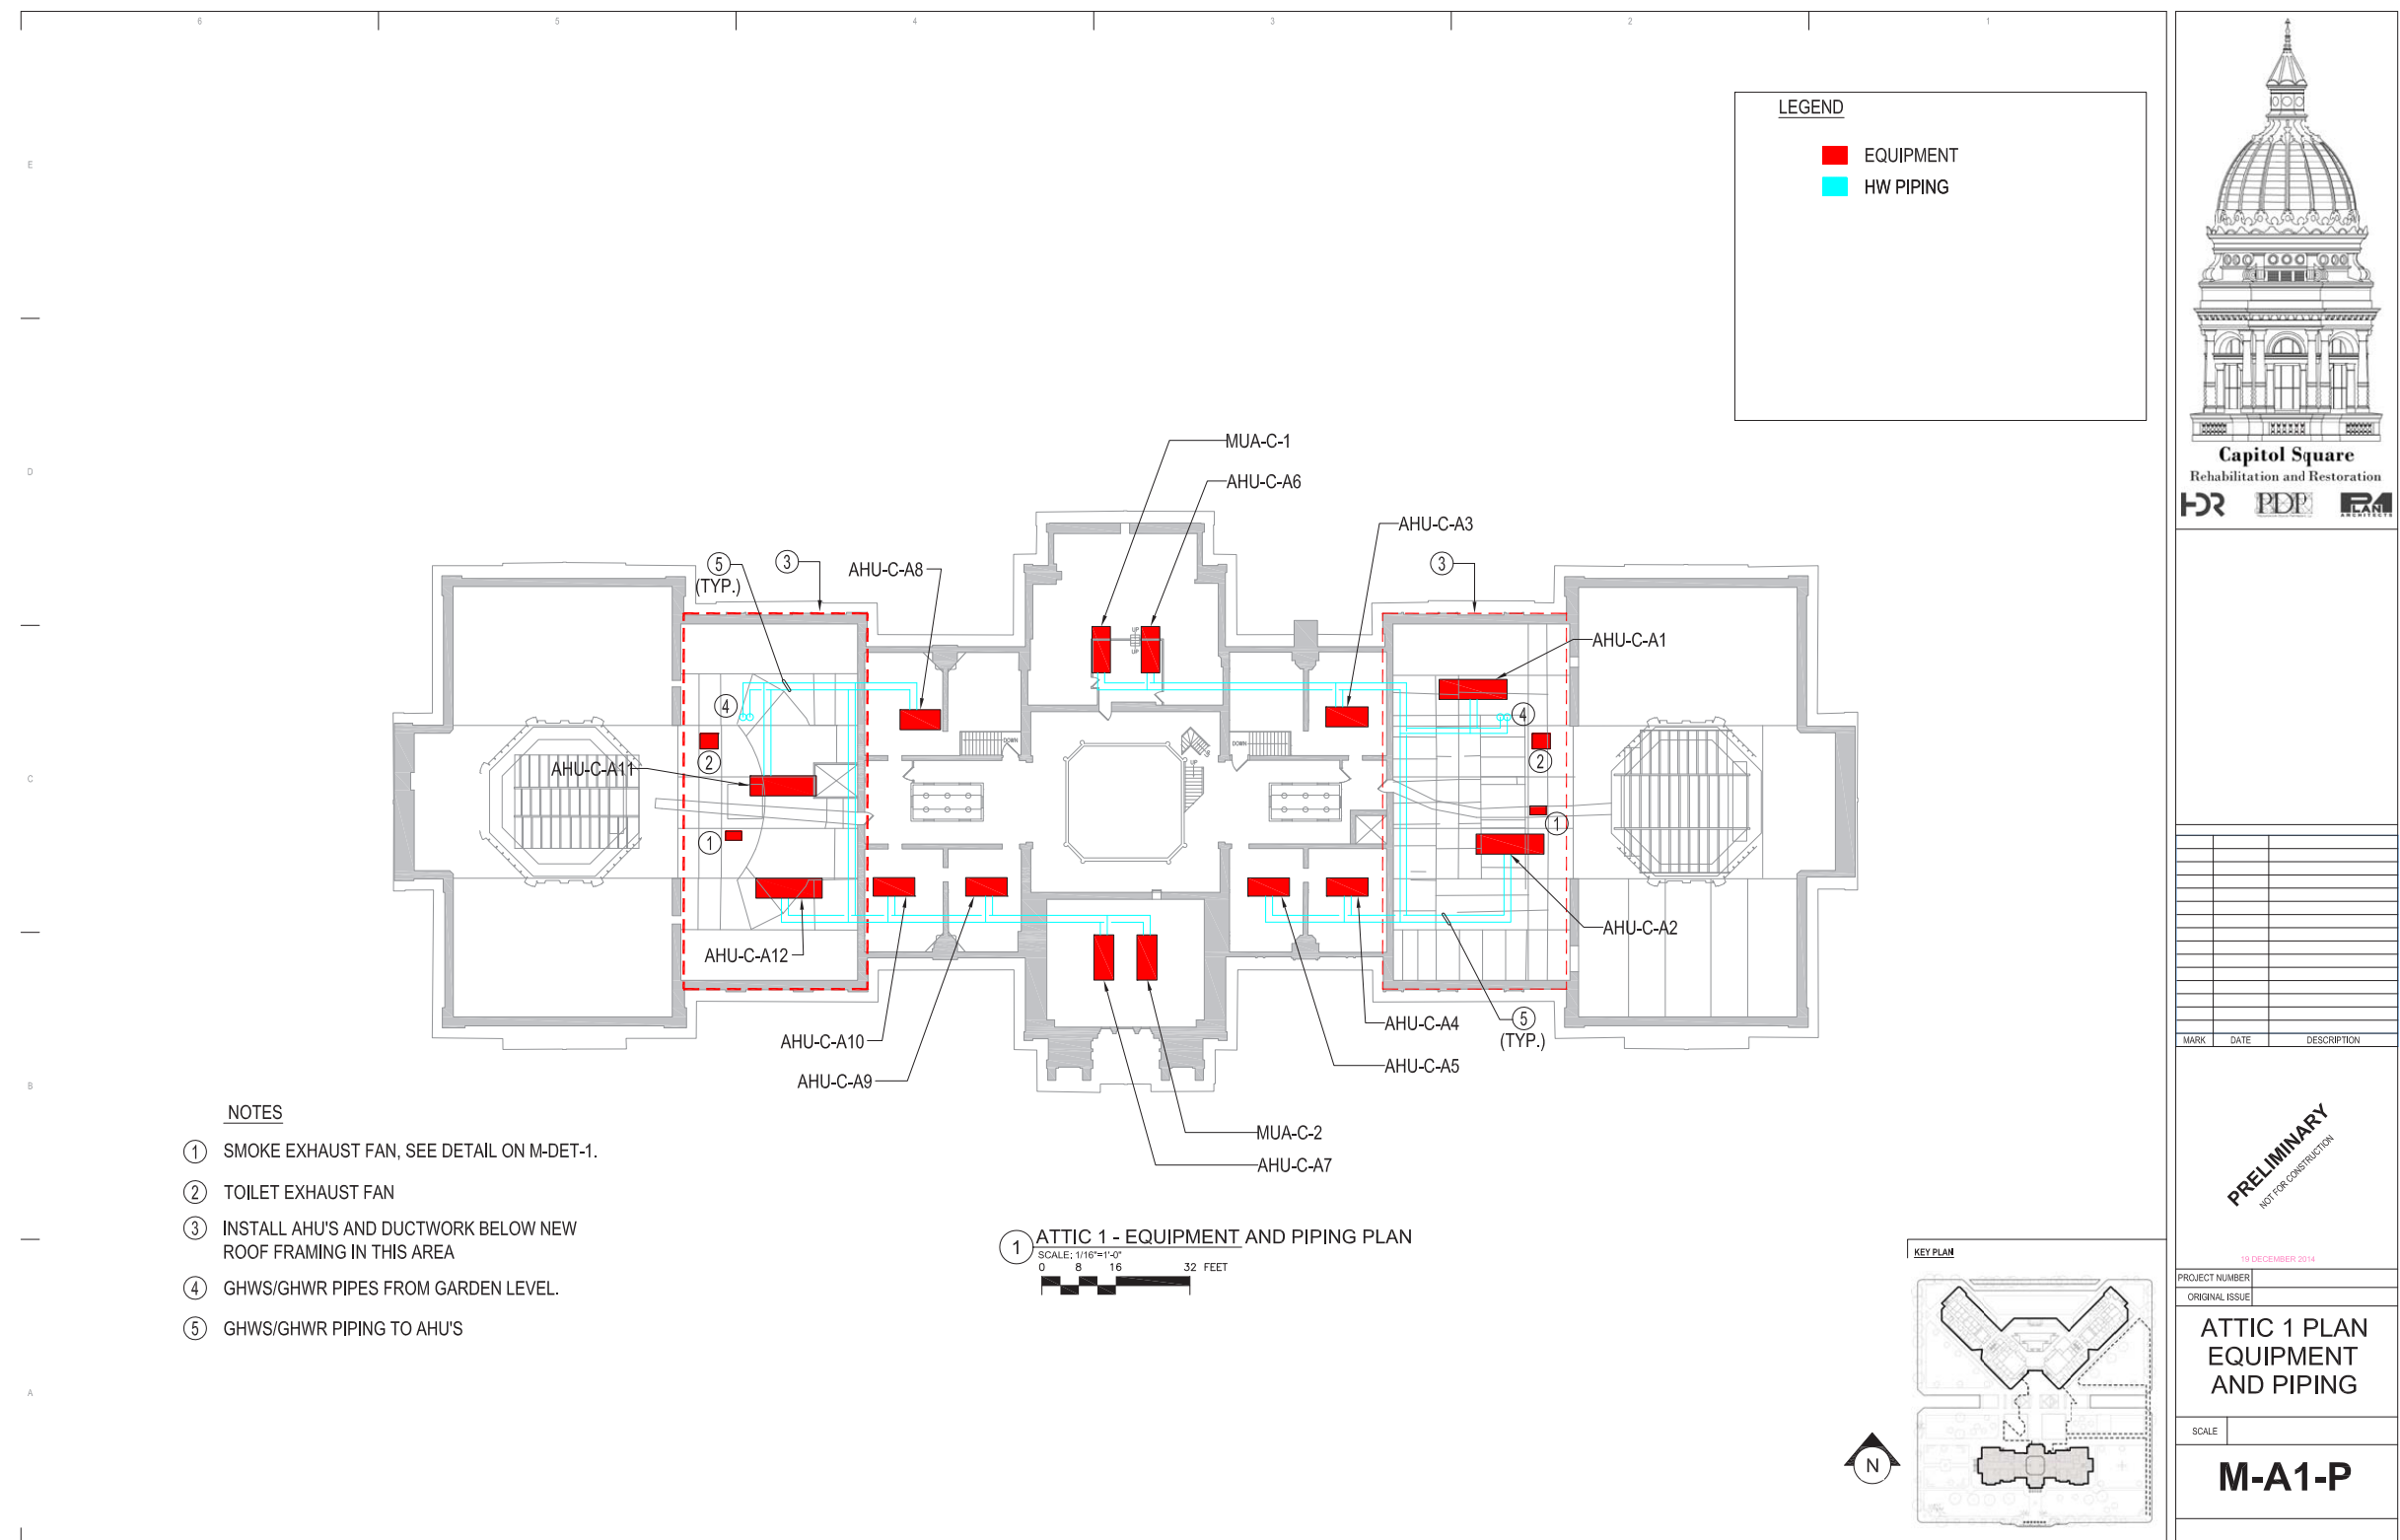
Attic 1 - HVAC Equipment and Piping Plan
